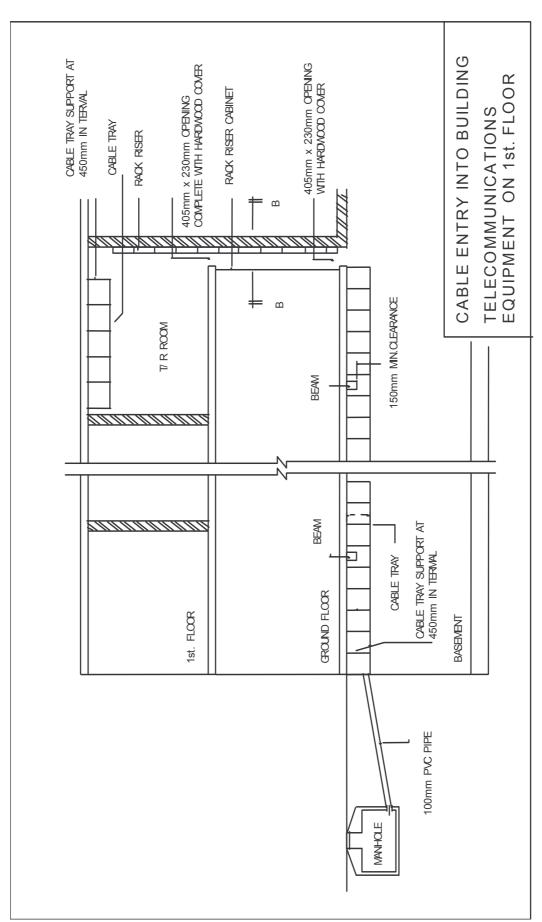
Cable Entry into Building, Telecommunications Room on First Floor
